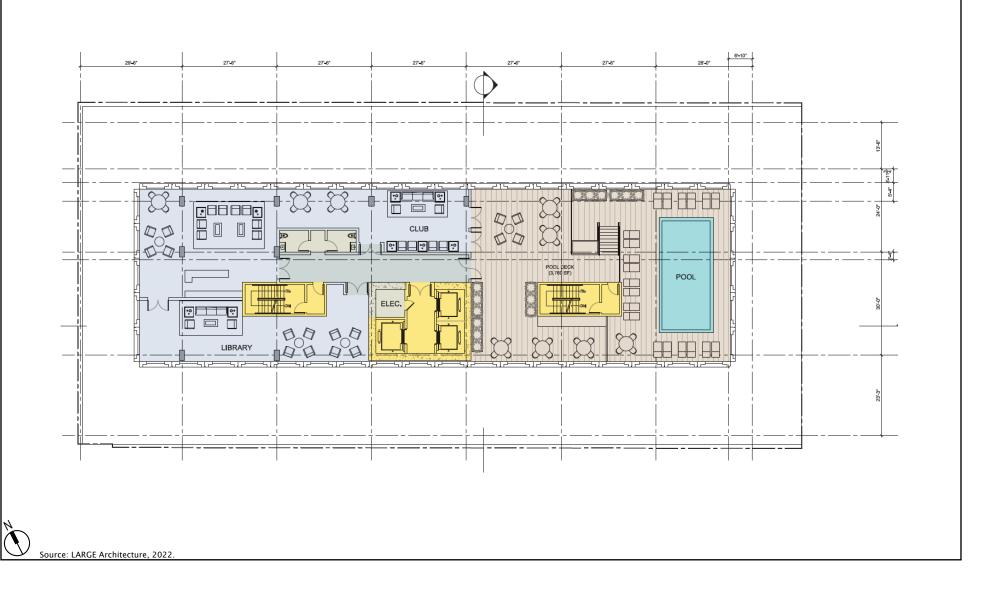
Roof Deck Floor Plan – 1431 Franklin Street Residential Project
